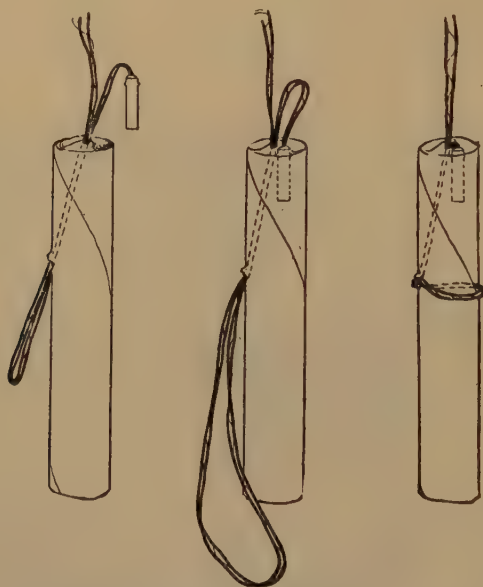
PRIMING METHOD FOR ELECTRIC BLASTING CAPS.
